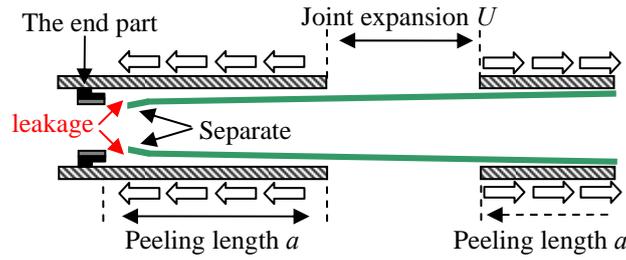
The leakage mode caused by separating of the seal hose from the end part
